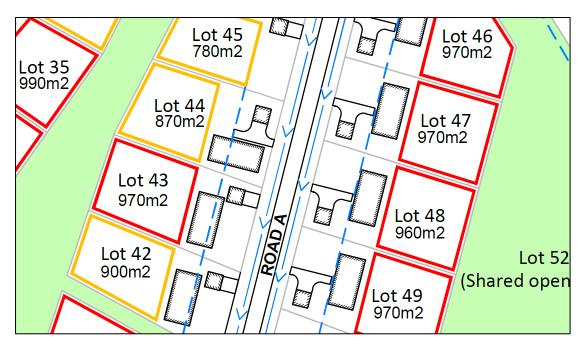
Typical Road Frontage Area Available for Stormwater Disposal
